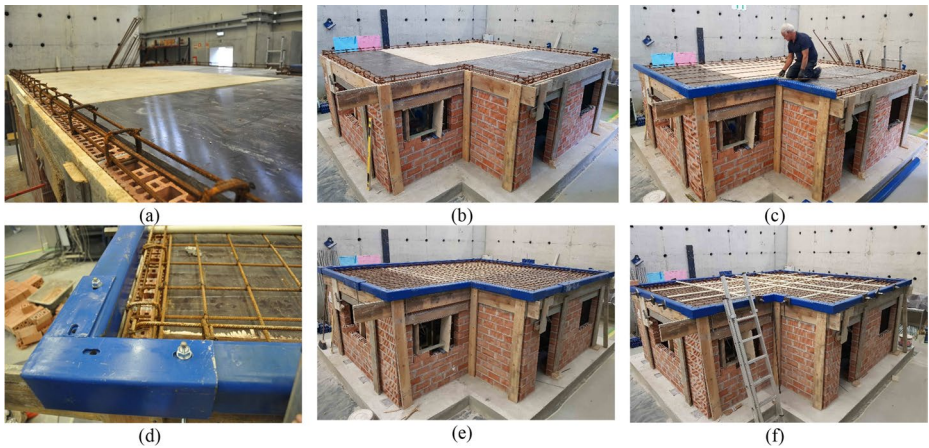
Construction stages of the RC slab: (a-b) embedded ring beams in the RC slab, (c-d-e) reinforcement and loading beam assembly, (f) installation of PVC tubes and post-tensioned bars
